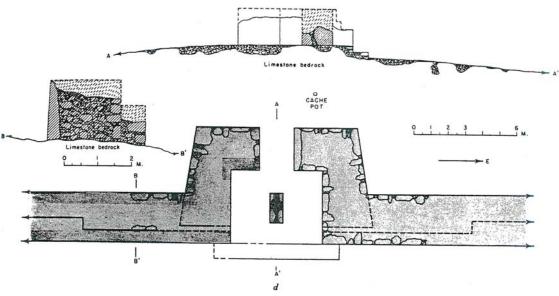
Plan and cross section drawings of Gate D (modified after Shook 1952:Figure 1d).
